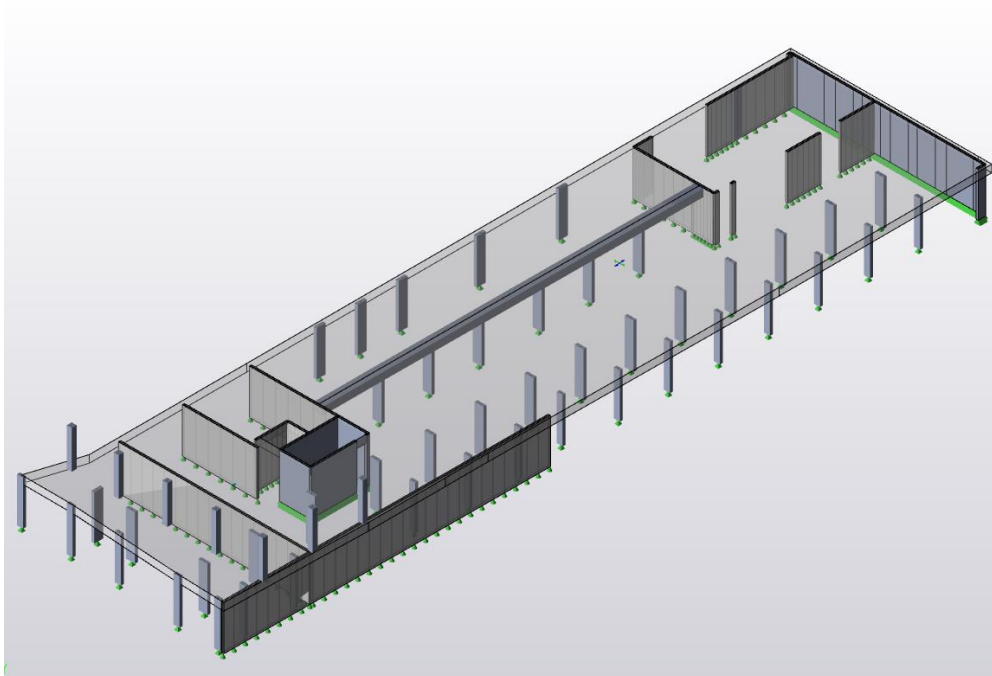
Blocks C northern wing substructure ground level transfer slab on RC columns and walls (view from northeast)
